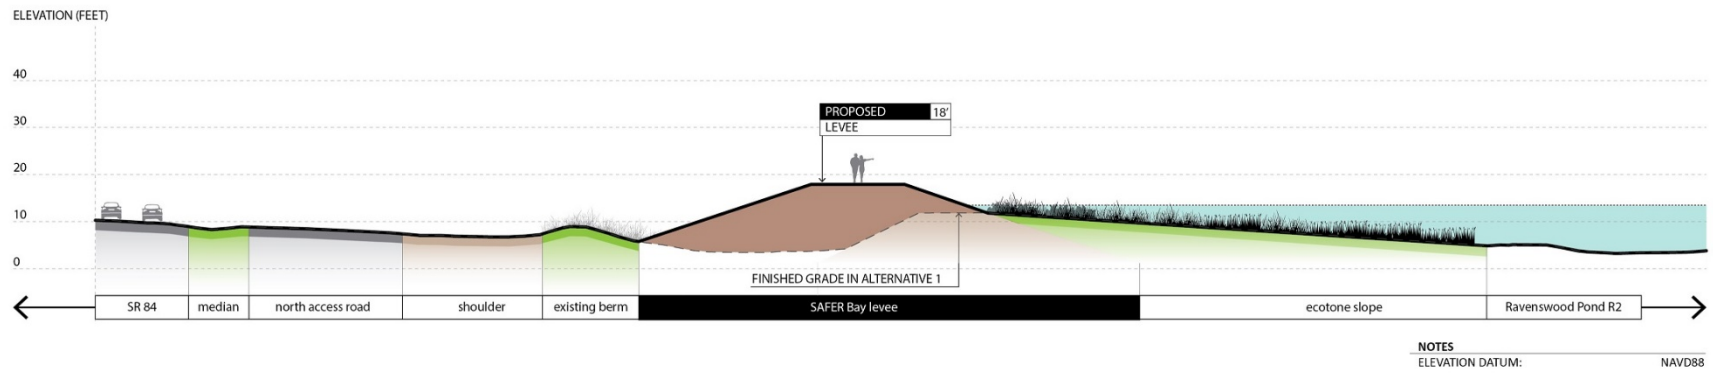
CROSS-SECTION OF THE NORTH ACCESS ROAD AND POND R2 FOR ALTERNATIVE 2 – PROTECT IN PLACE
